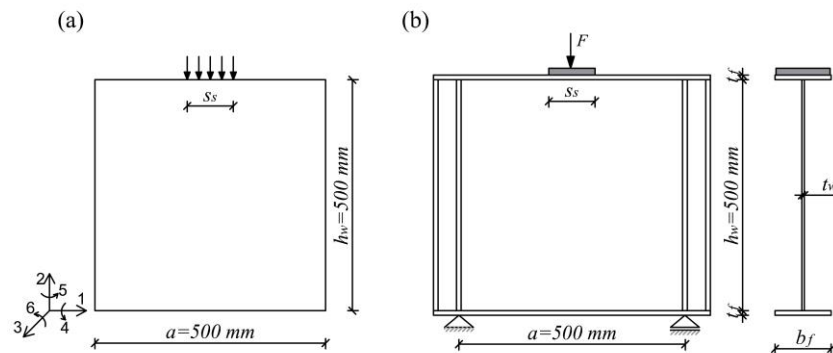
(a) Plate under patch load; (b) I-girders under patch load
